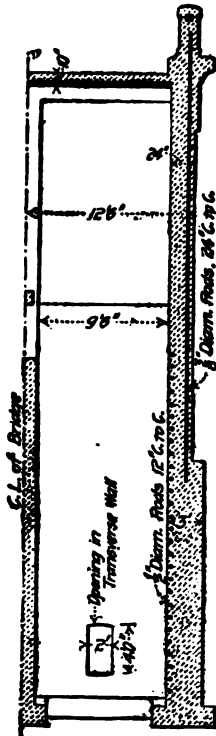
Spandrel Wall, Piney Creek Bridge.
